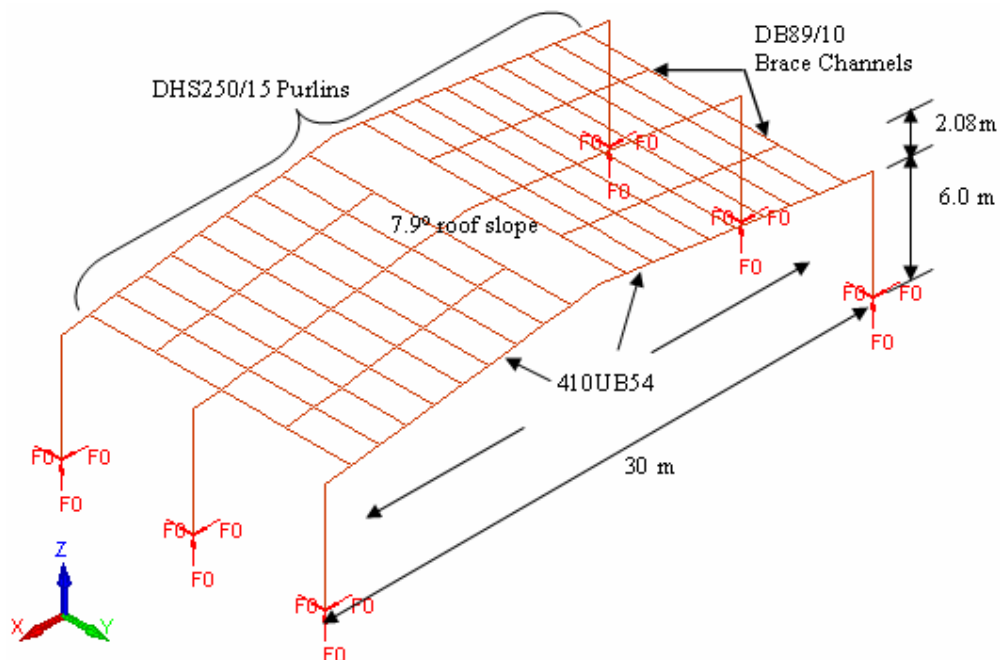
3D structural model of two bay steel portal frame structure in SAFIR
